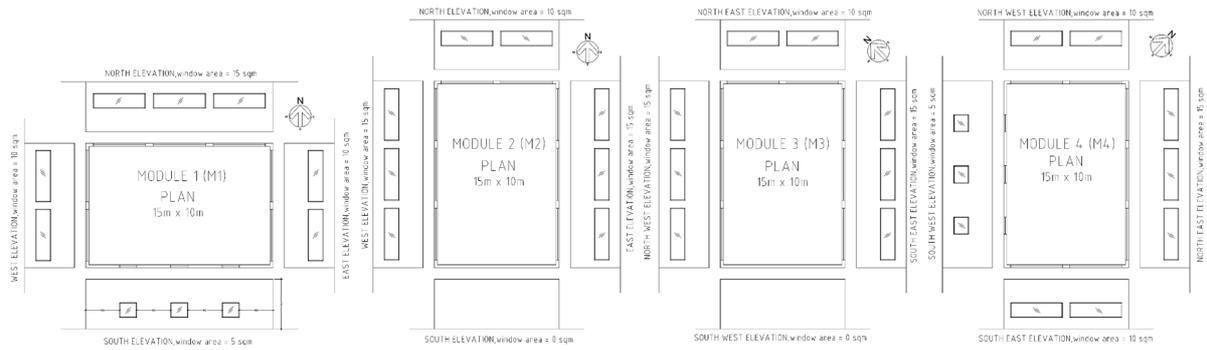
Plan & elevations of design cases for Kolkata 20 WWR
